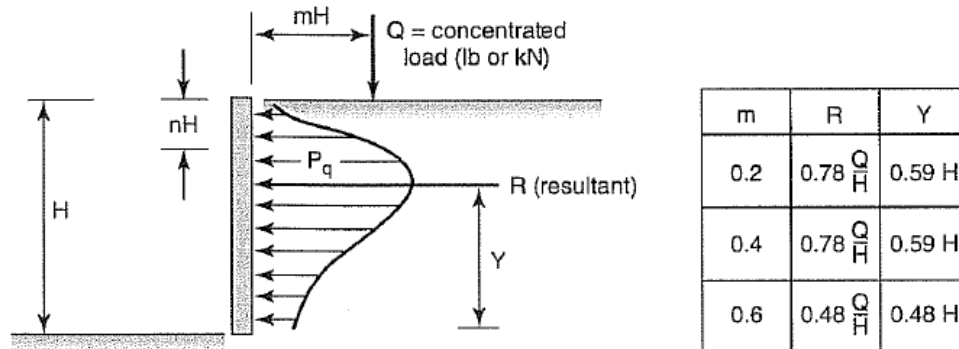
Pressure distribution against vertical wall resulting from point load, Q .
